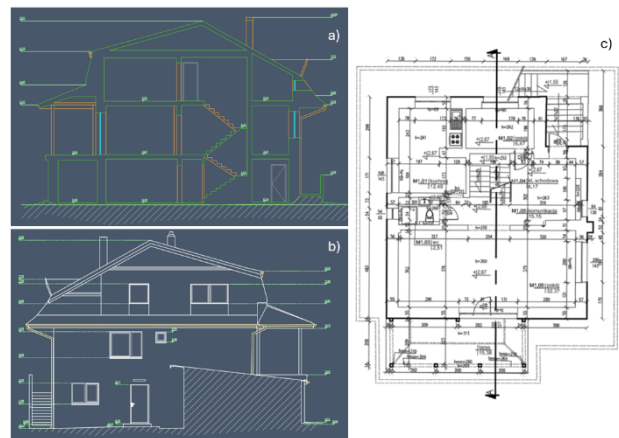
Examples of plans: a) Cross-section through the building, b) building elevation, c) documentation.
